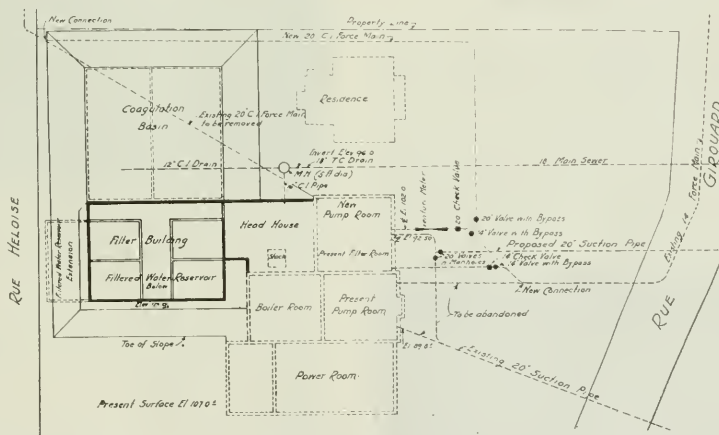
General Plan of St. Hyacinthe Filtration Plant
